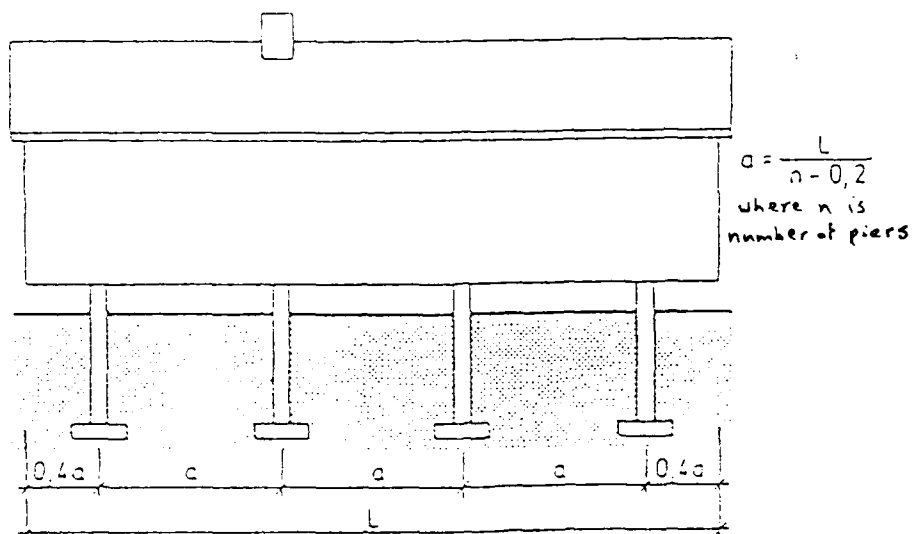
pier positions to give approximately the same load on each pier under a bearing wall.
